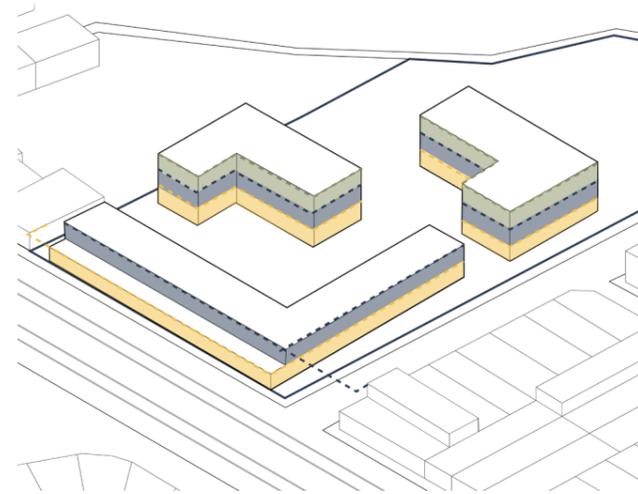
Reconfiguration of Street Profile and Heights Diagram. | Source: Author's elaboration
